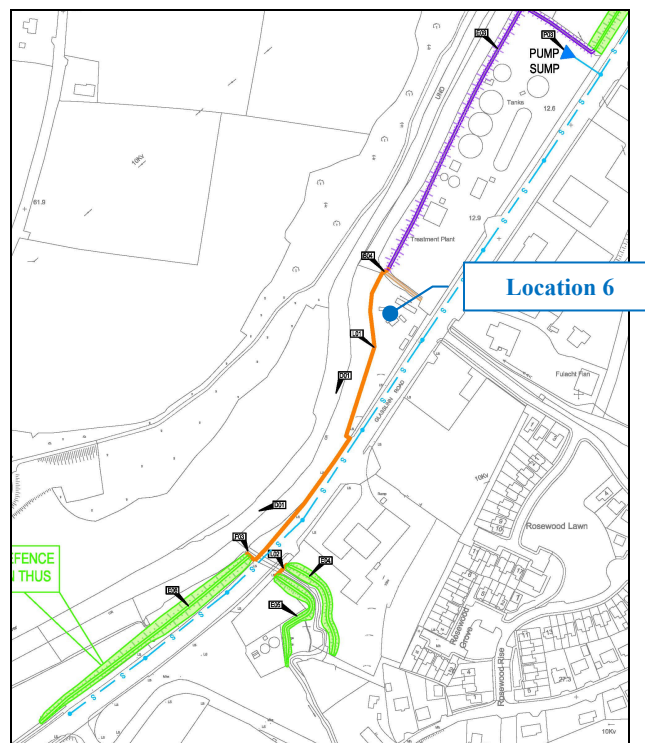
Site Layout Showing Approximate Positions of Measurement Location 6
